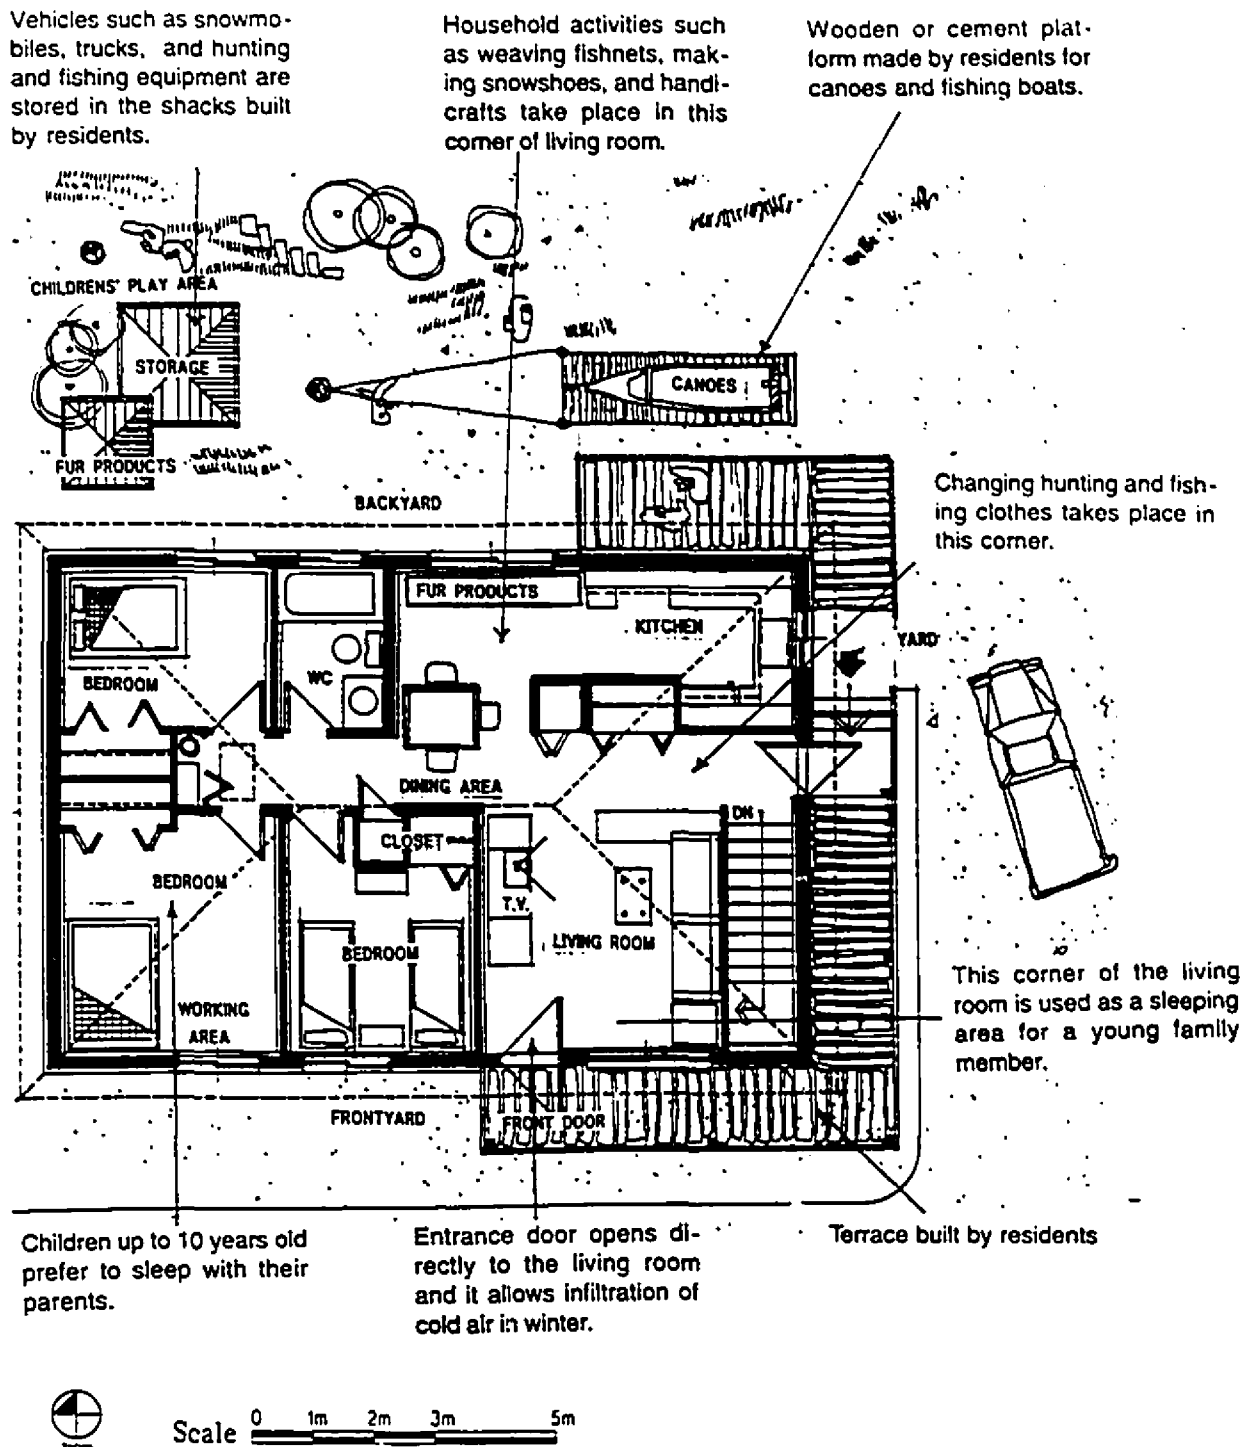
Existing condition of a Bo Plex House in Waswanipi. (observation date: September 1993, source of plan: the CHC).
